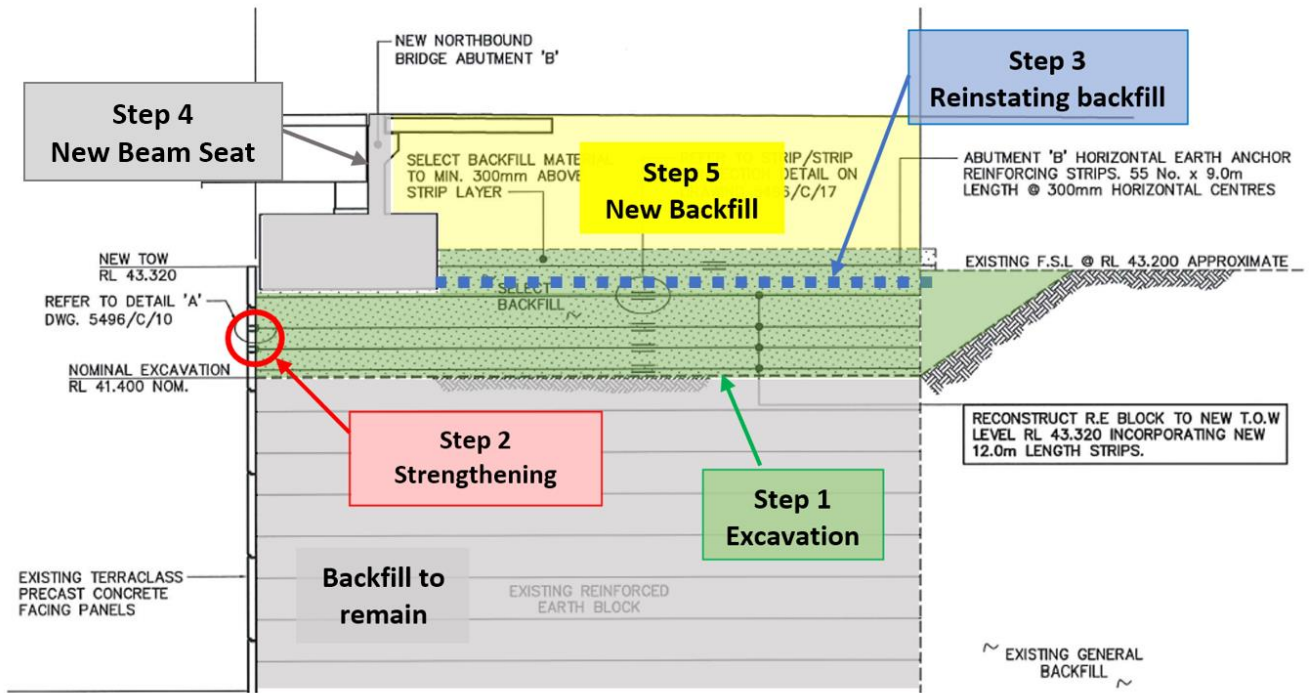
North Abutment (extract from 2011 Design drawing) - Construction Steps
